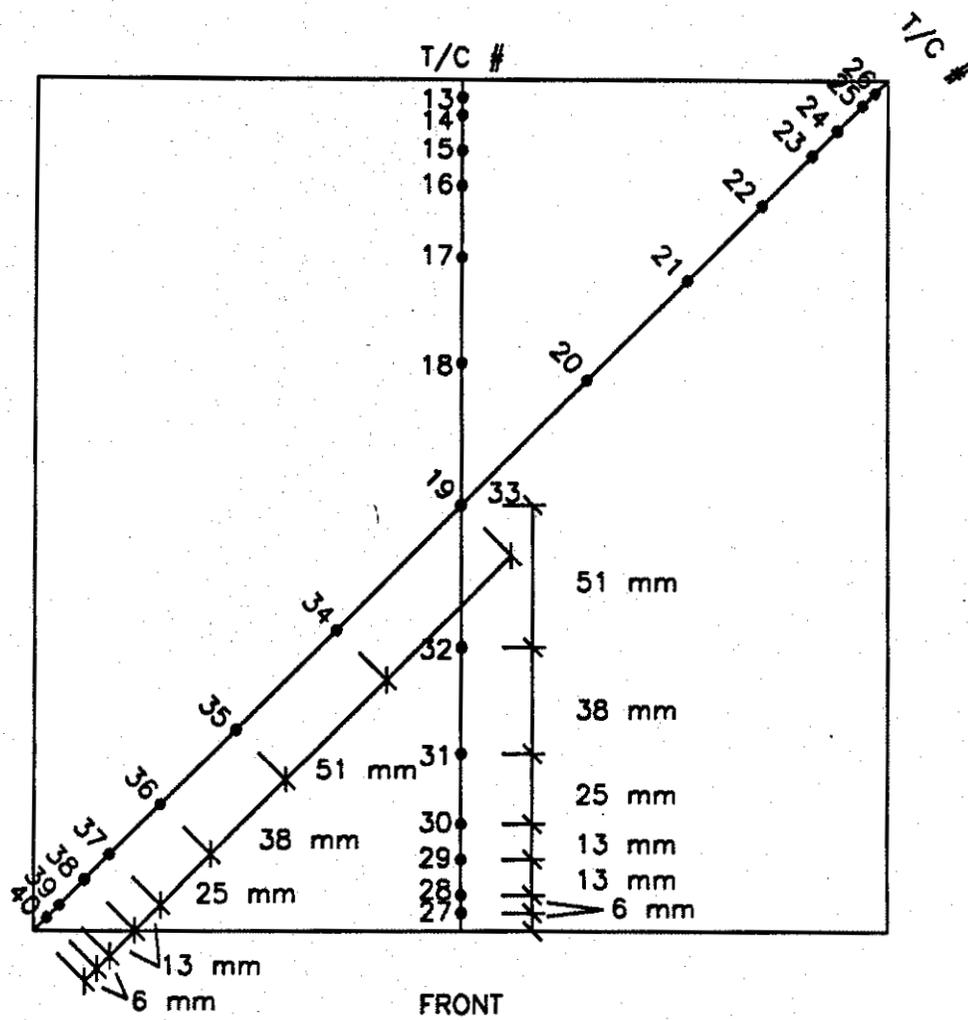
LOCATIONS OF T/C'S IN FRAMES: COLUMN NO. 2
